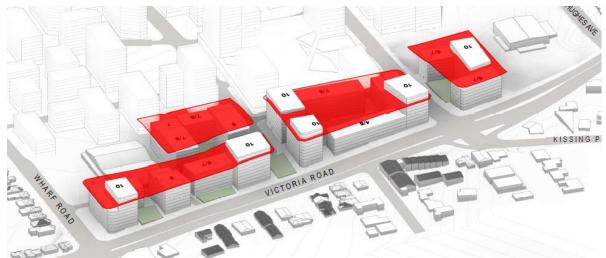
Building Envelope Height Breaches as originally approved (28m building height plane in red).
